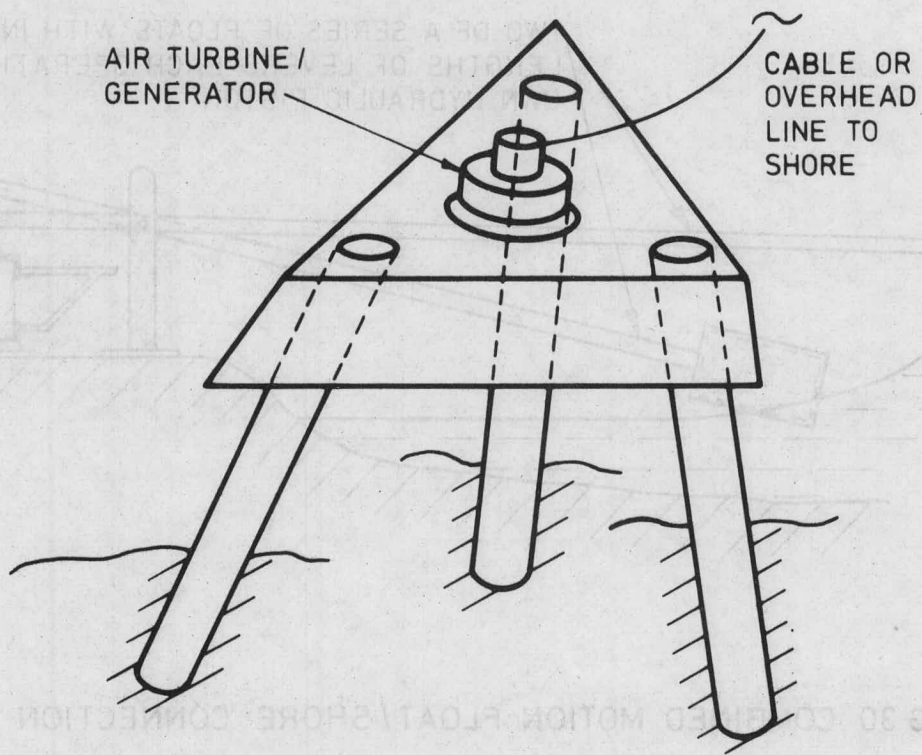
TRAVELLING WAVE CHAMBER/SEA BED CONNECTION
